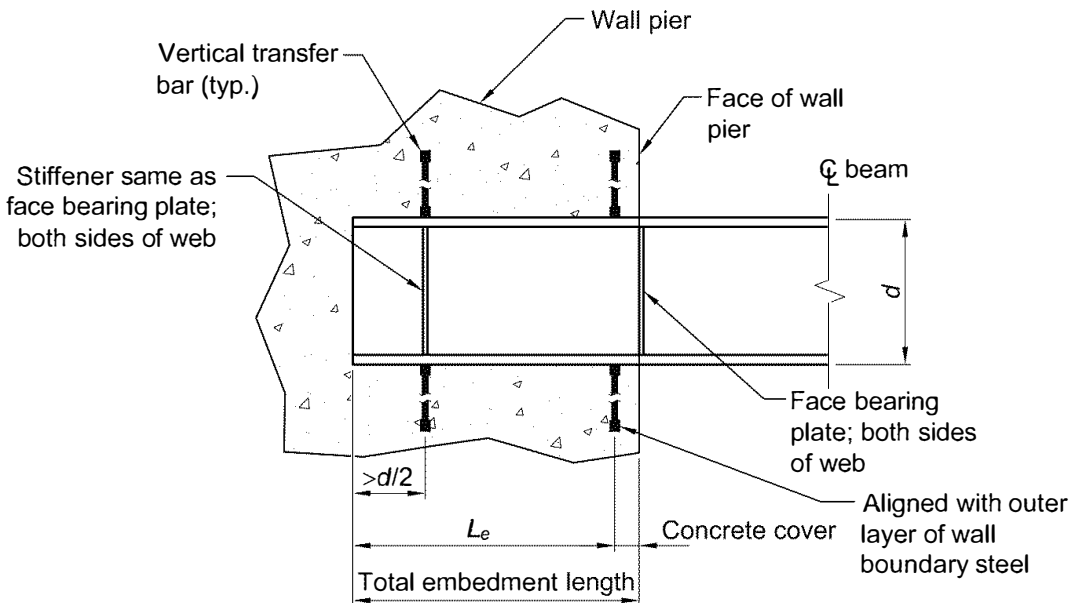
Placement of vertical transfer bars and face bearing plates.
